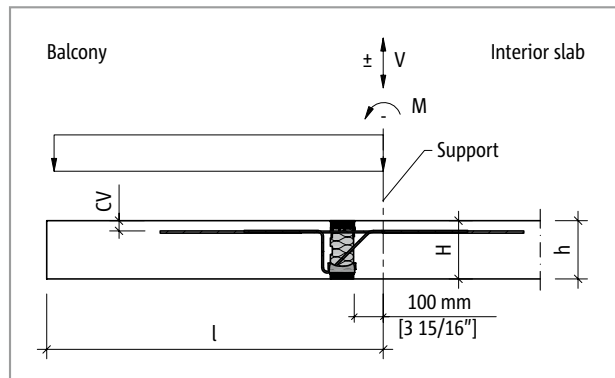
Schöck Isokorb® T Type CK: Structural system
